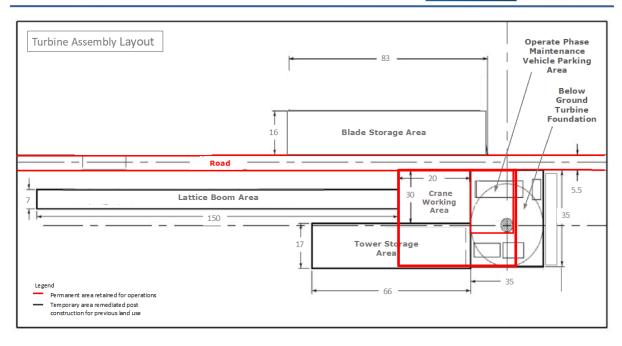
Typical Wind Turbine Footprint and Hardstand During Construction
